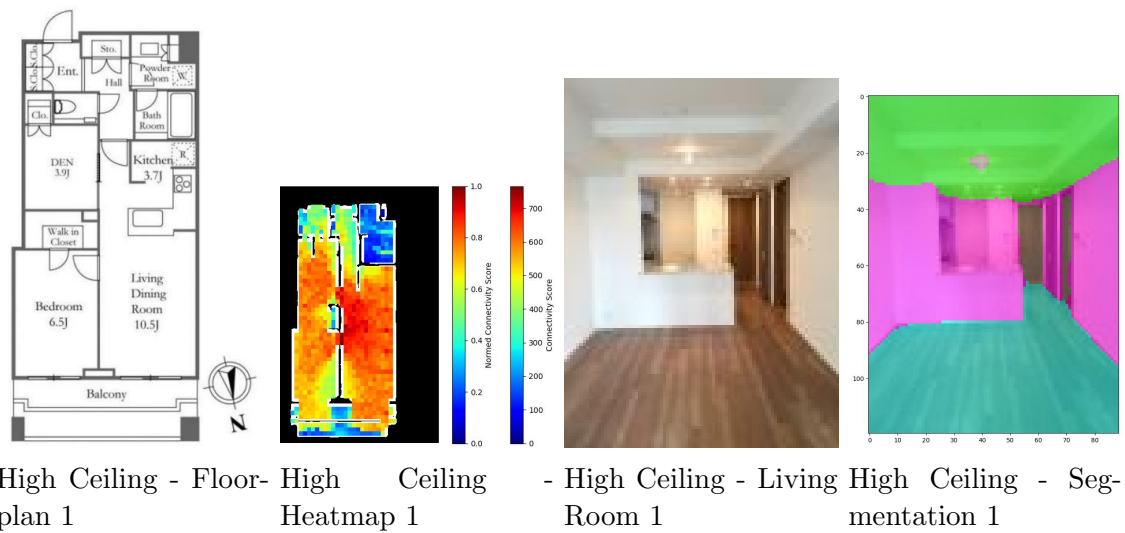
High ceiling visibility property 1 - floor plan, heatmap, living room, and segmentation.
